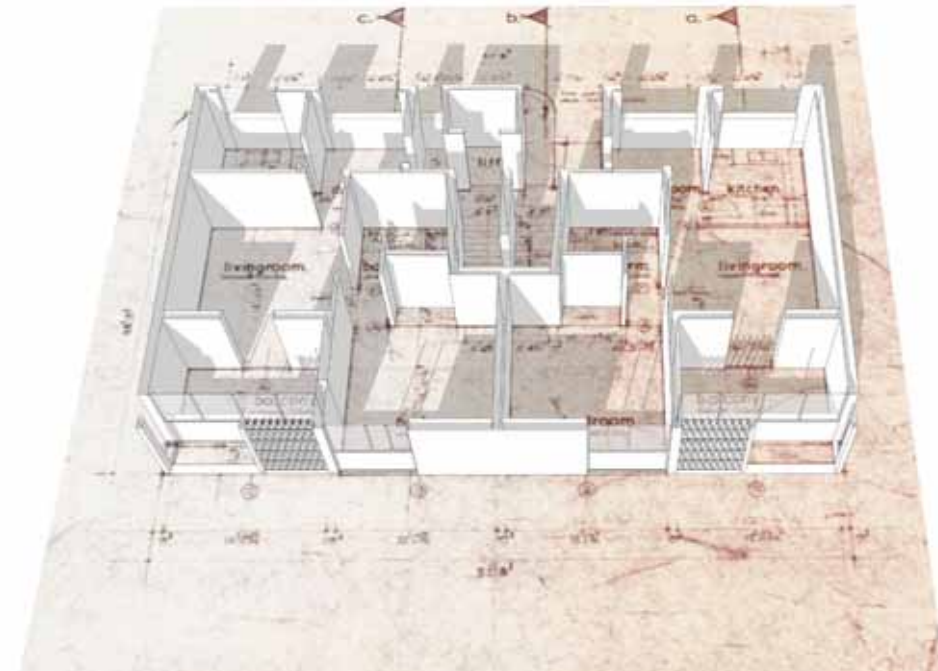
Existing plan layout for floors 1 - 4 (Author, 2010).
